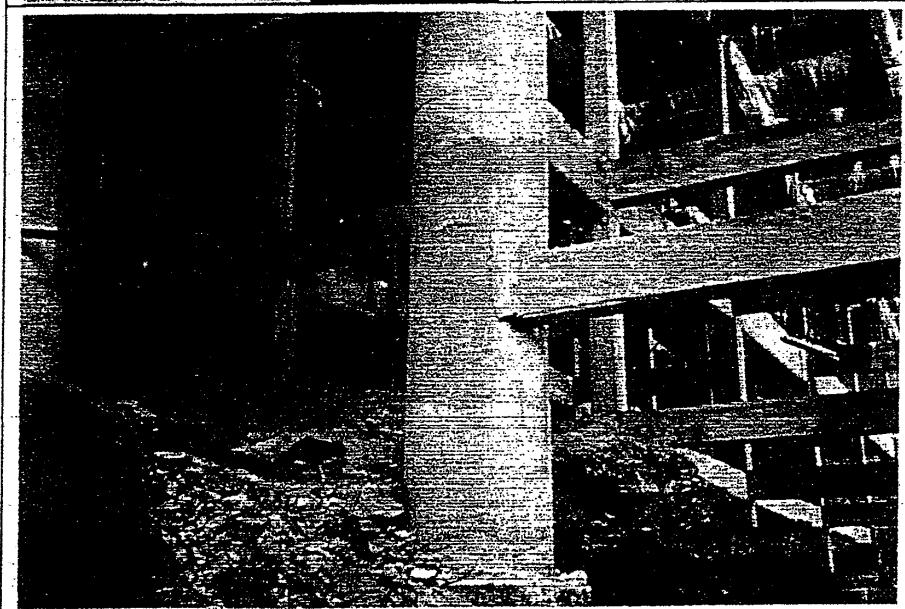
Note tie beam fracture at column connection. This particular massive column under Memory Hall must be restored, however the stair support beam must be removed and replaced. Also note stalactites and efflorescence on columns and beams in background confirming contamination and ongoing corrosion-related deterioration.
